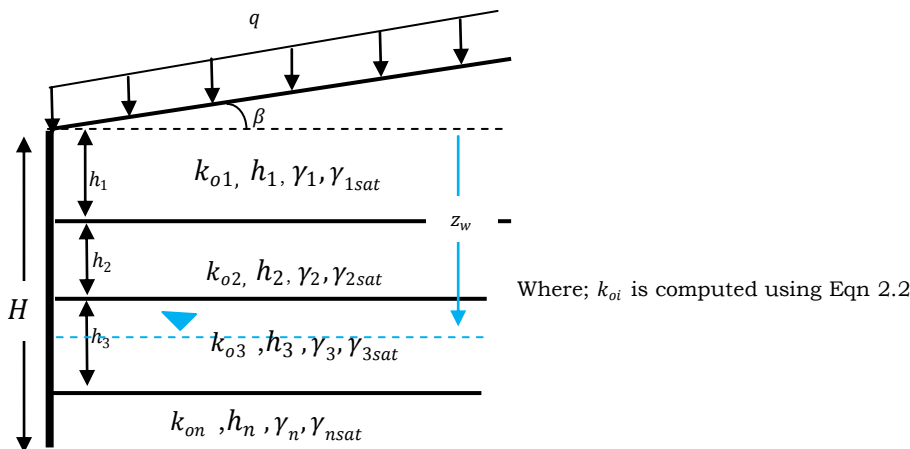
Multi layer soils with vertical retaining wall and inclined ground
